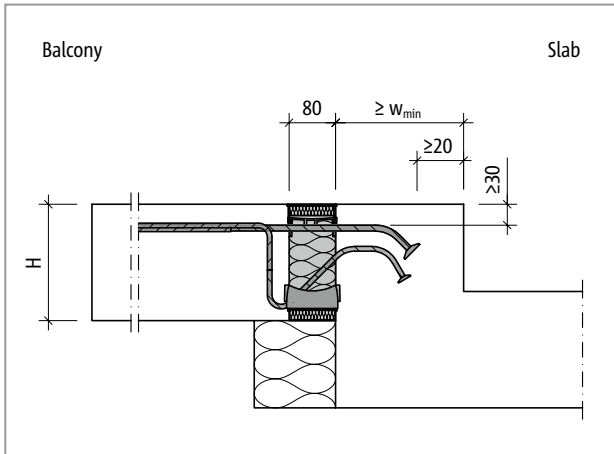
Schöck Isokorb® T type K-O: Balcony with height offset upwards and external insulation
